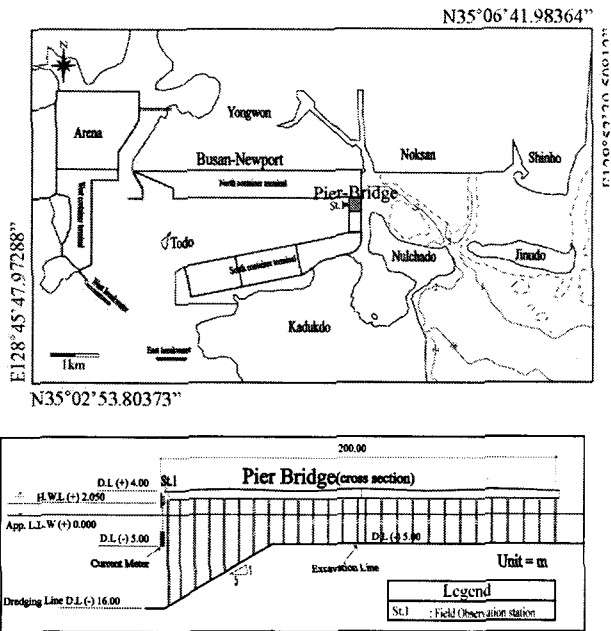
The station of pier bridge in Busan Newport and the sampling location of cross-sectional pier bridge.
